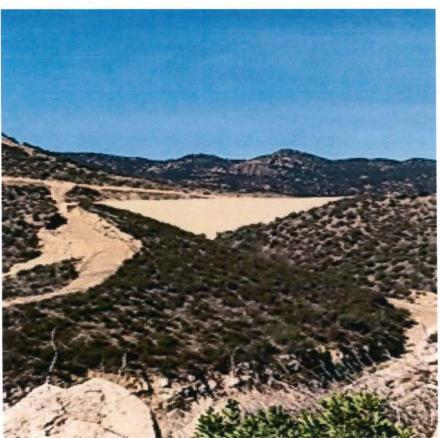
View facing west of the graded slope and the fill material that was placed to construct the berm for a road.
